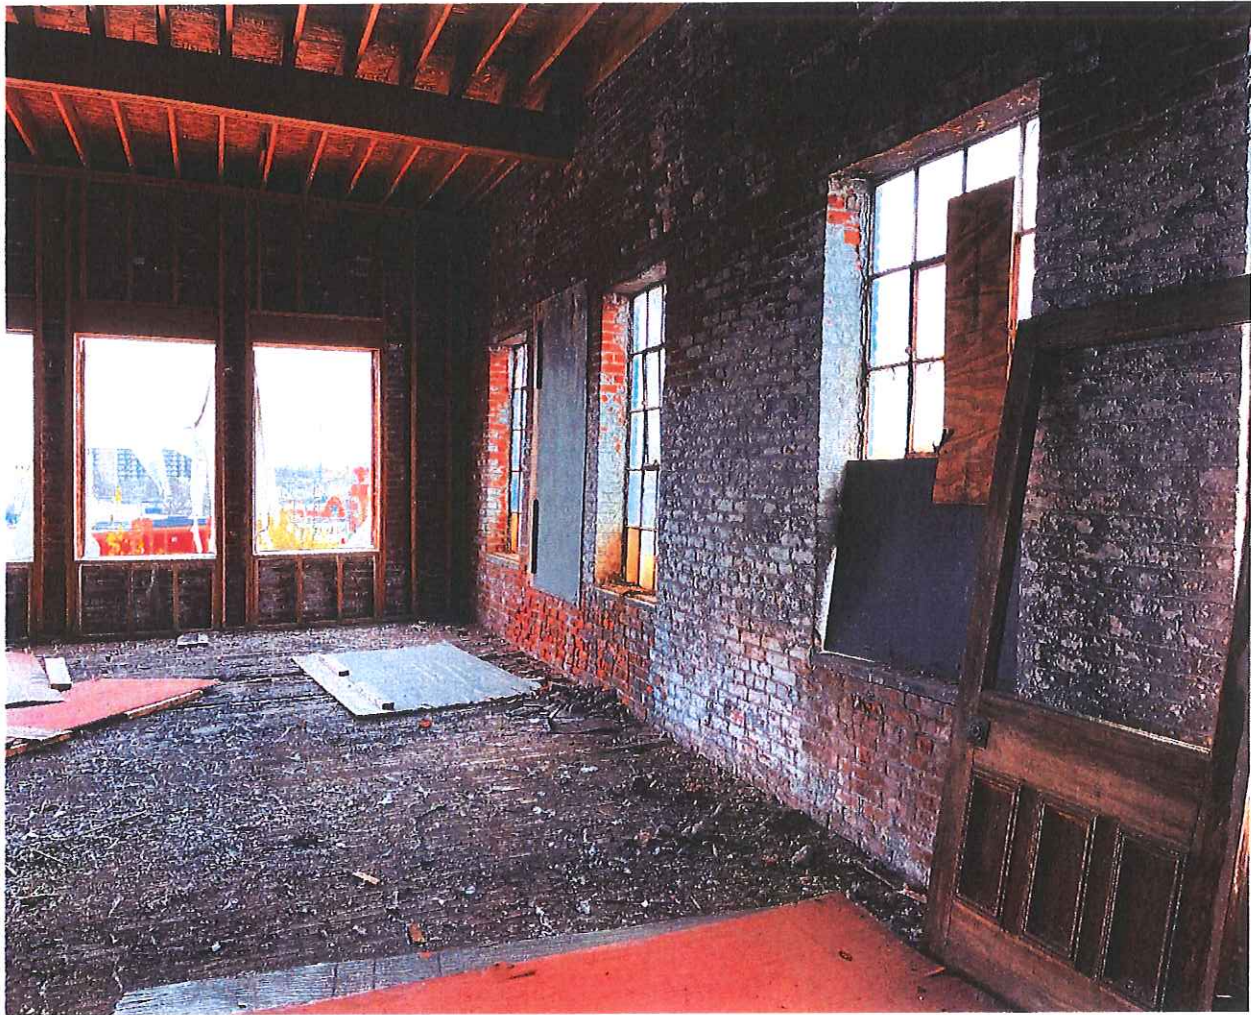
Third floor, looking east, southeast at the southeast corner of 1301 Adams Street, showing new section of roof.
